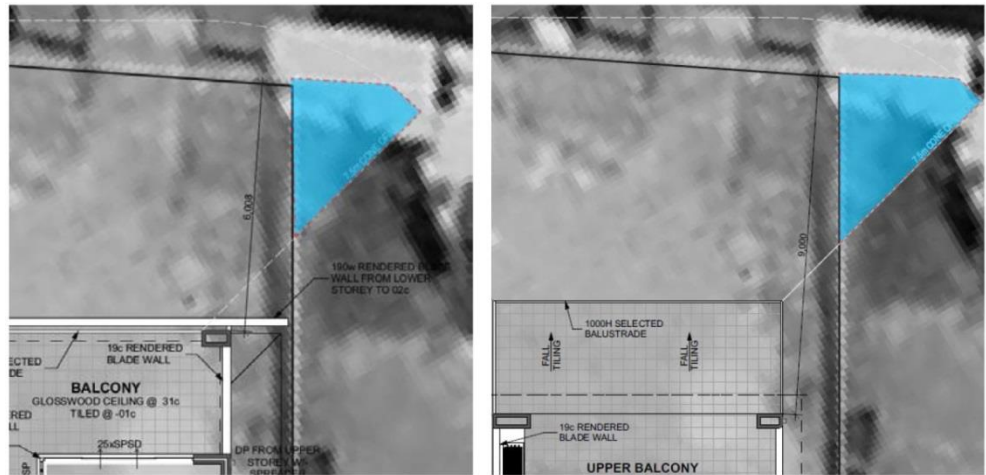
Extent of overlooking from ground floor (left) and extent of overlooking from first floor (right)
